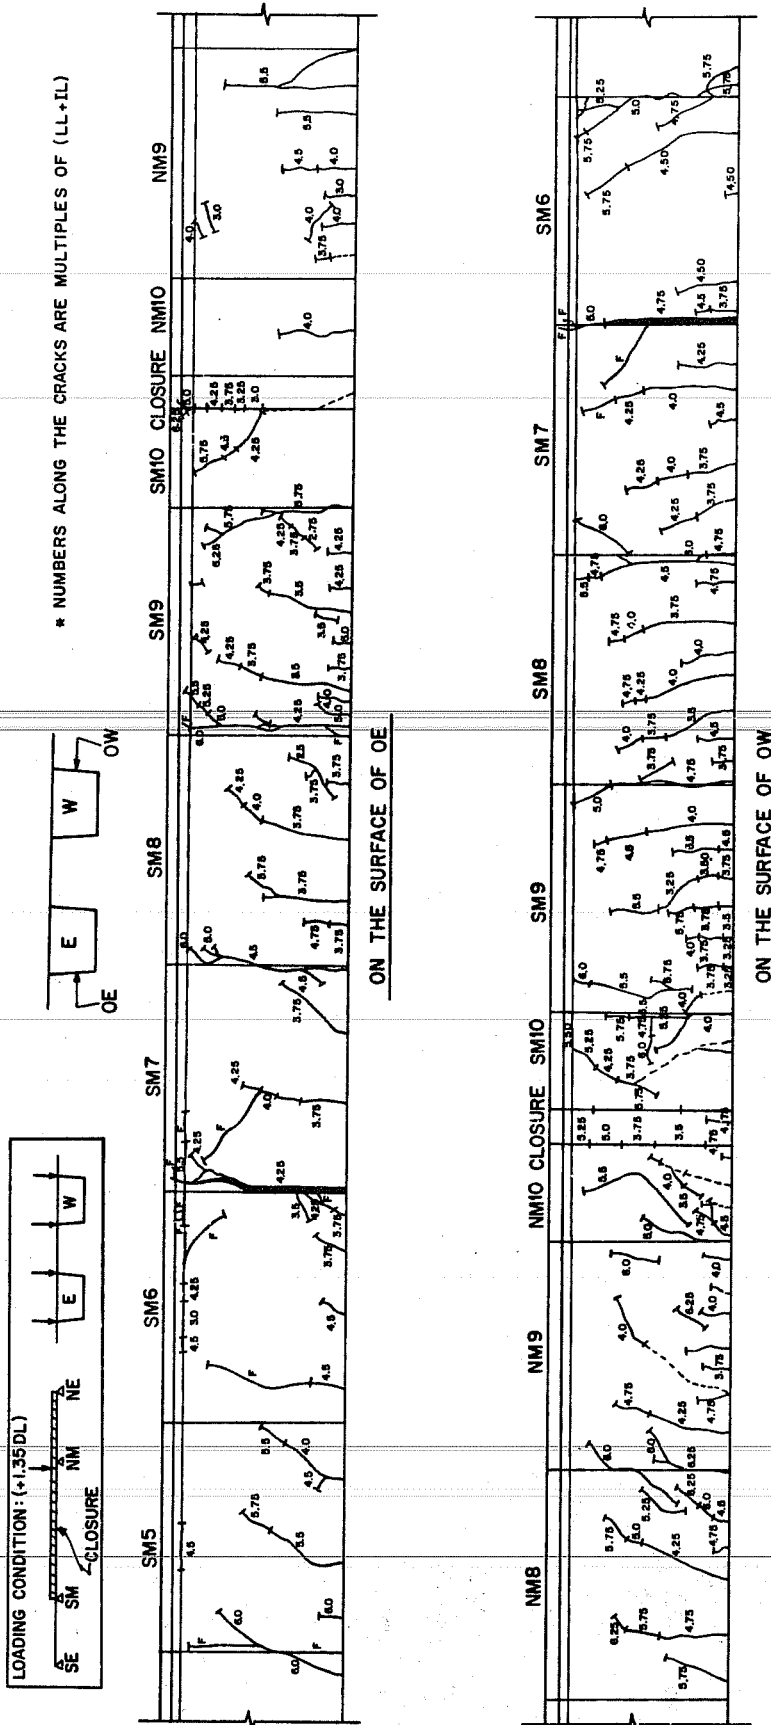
Development of cracks around the center of main span during loading to failure
